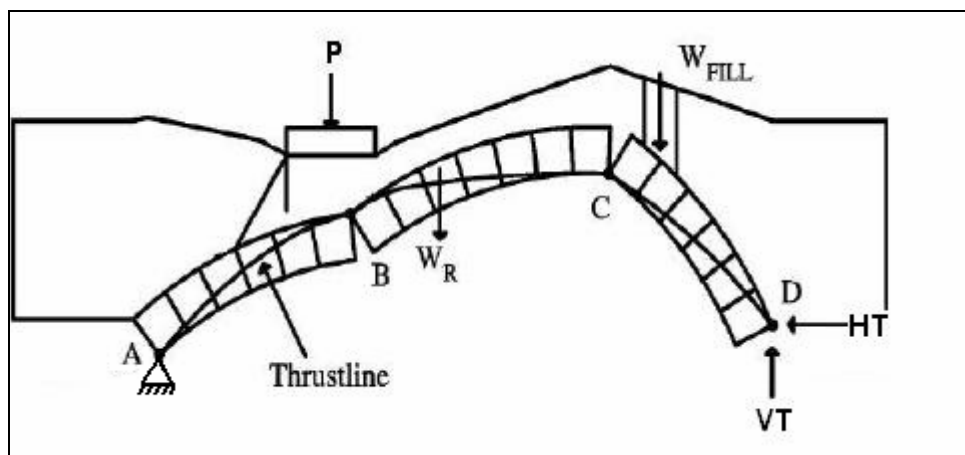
Failure mechanism of a masonry arch [43]
